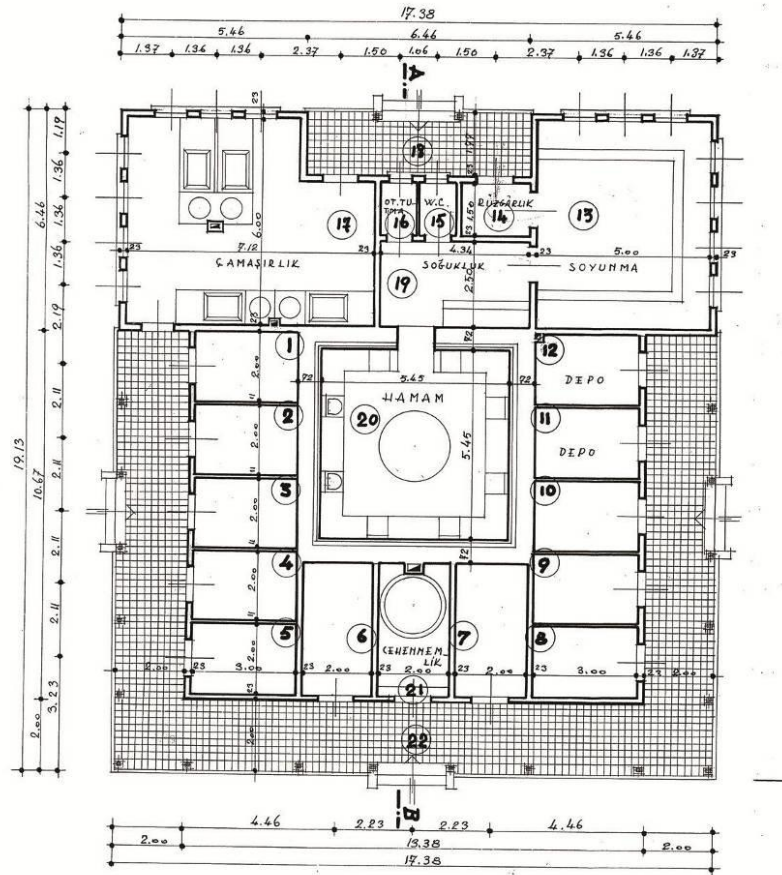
The plan drawings of the Hamam in beer factory (TTA archive)
